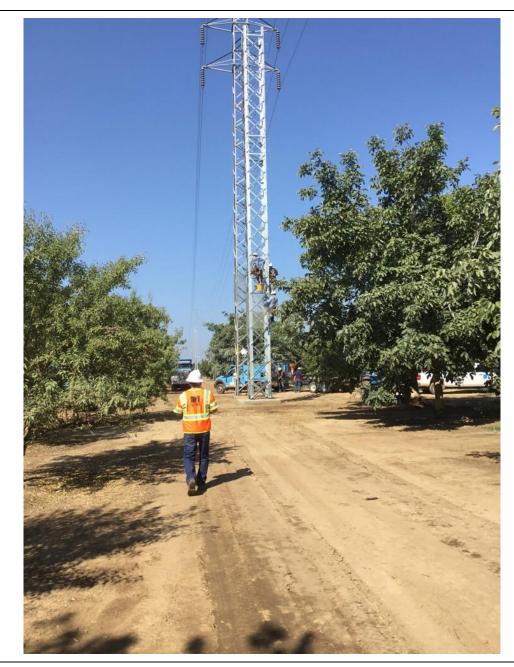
Tower installation Bogue Sub-Line Segment Pole 4/35.
